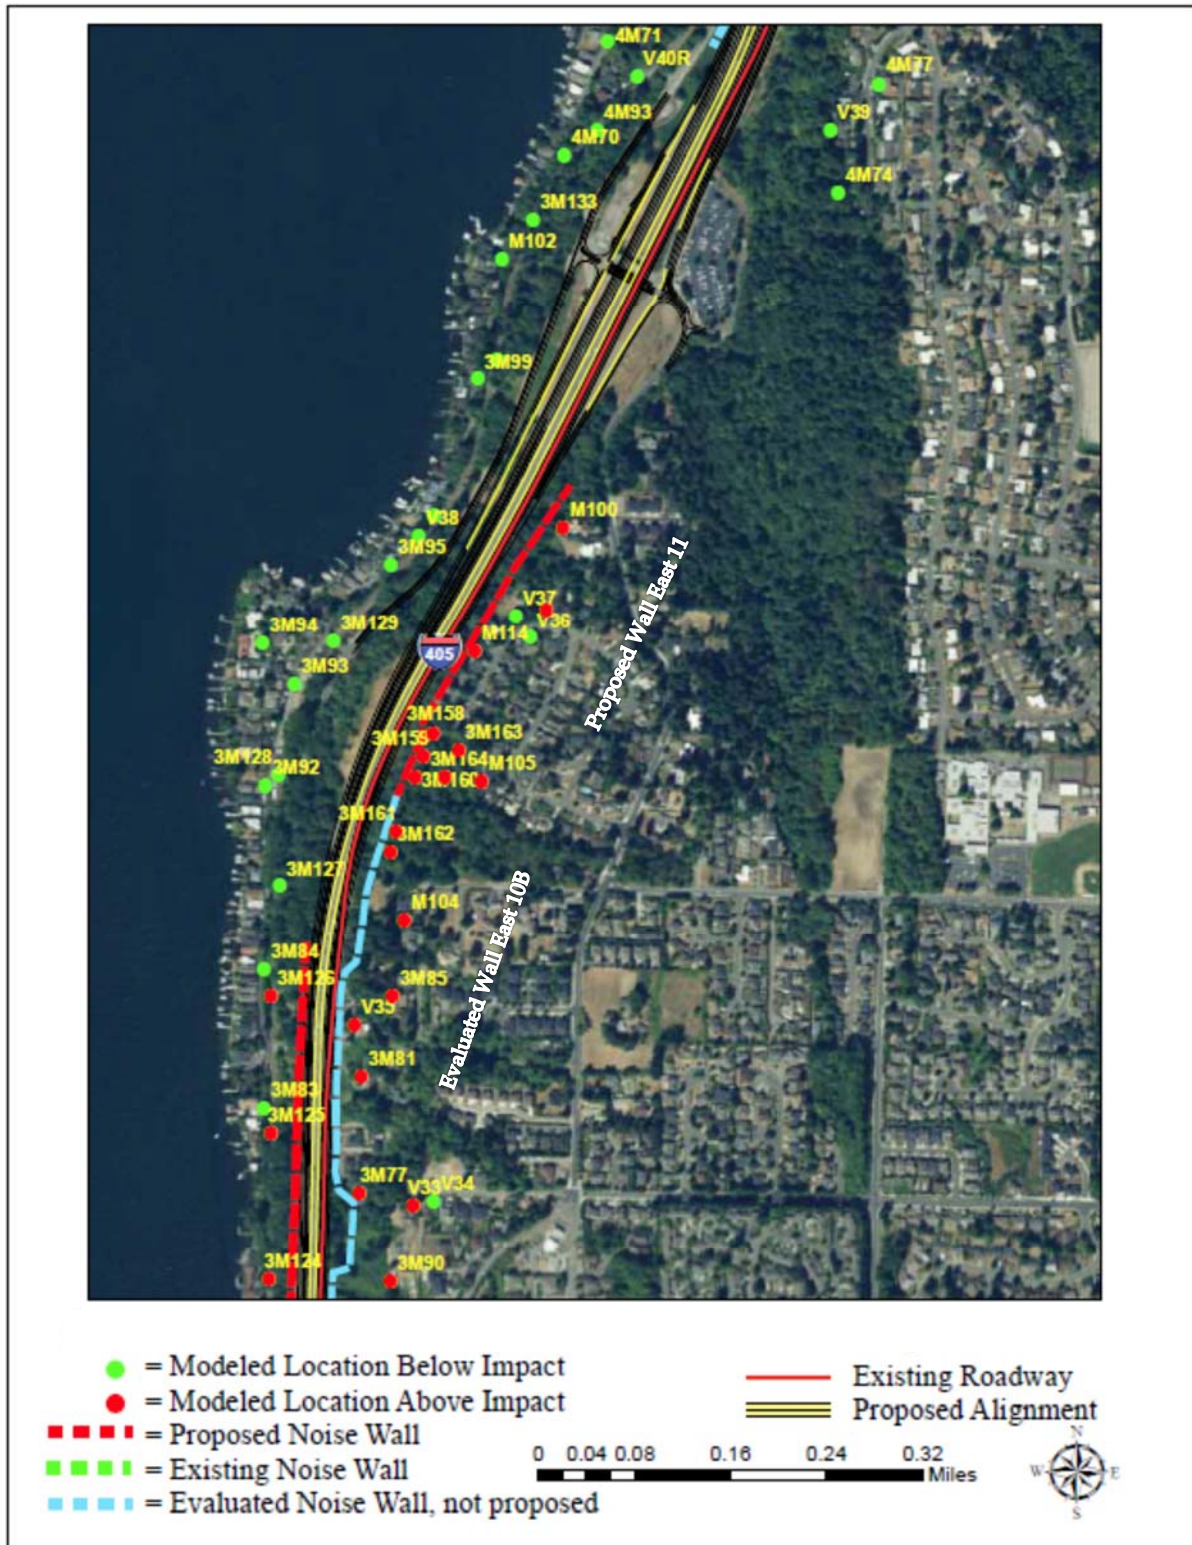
Evaluated Noise Wall Alignments – Lake Washington Boulevard SE to SE Coal Creek Parkway
